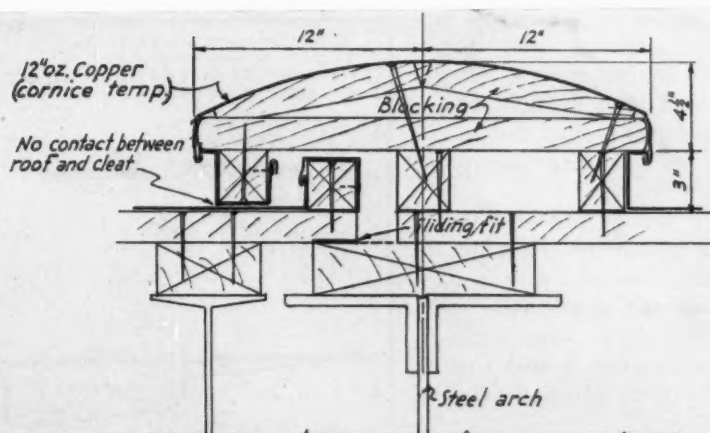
SECTION R-R - EXPANSION JOINT THRU RIB ON ROOF
